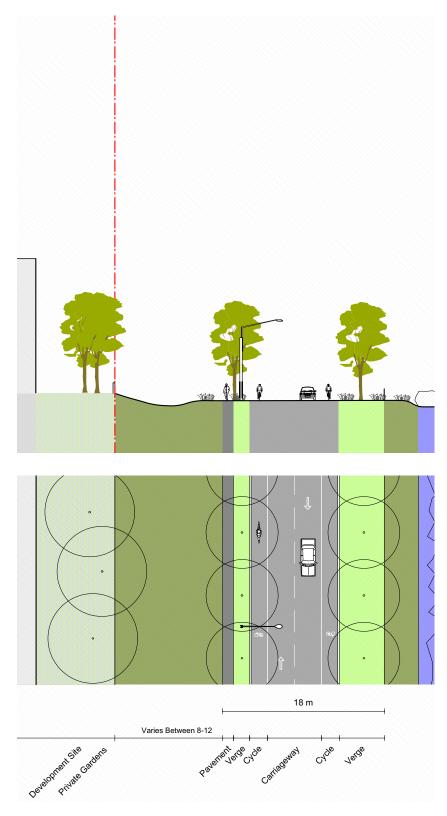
Bennelong Parkway – Typical Section and Plan View North
